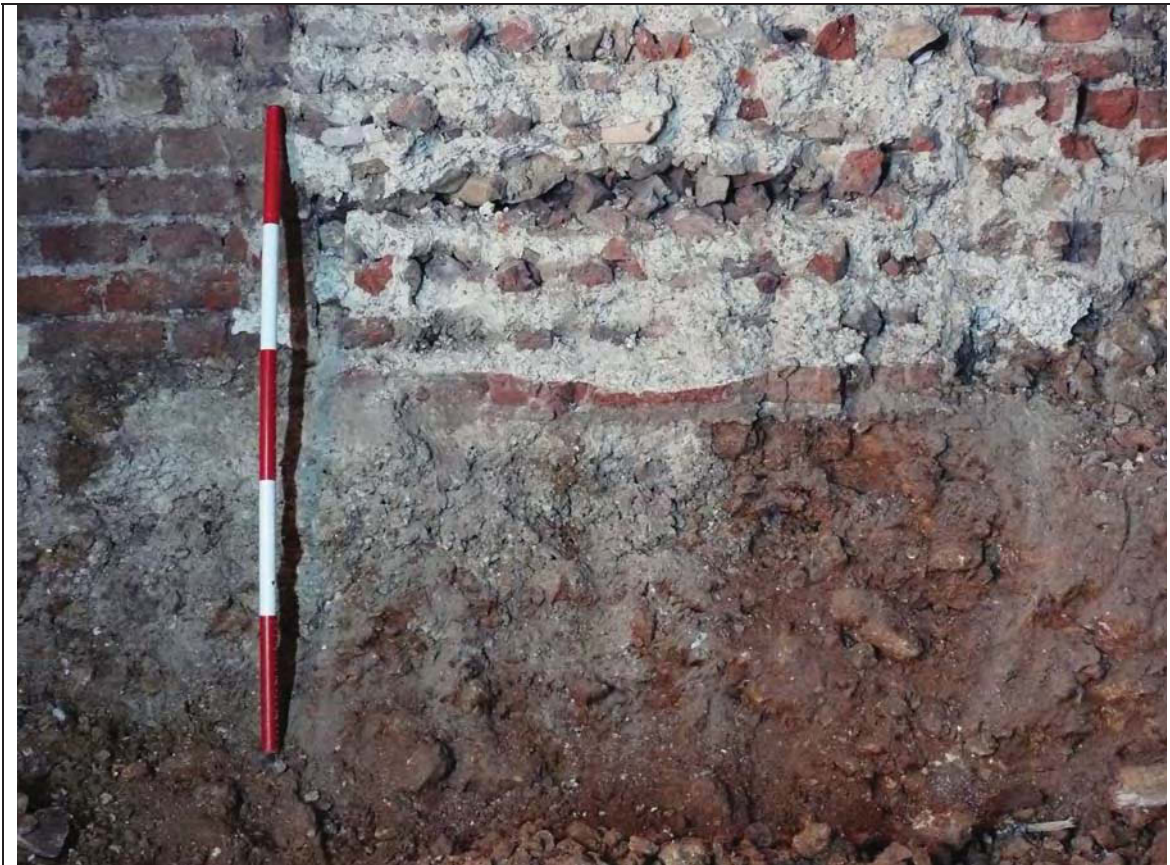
Exposed section in lower basement of the site. Photograph shows base of original floor level (at base of brick course) and underlying decalcified Head Gravels.
